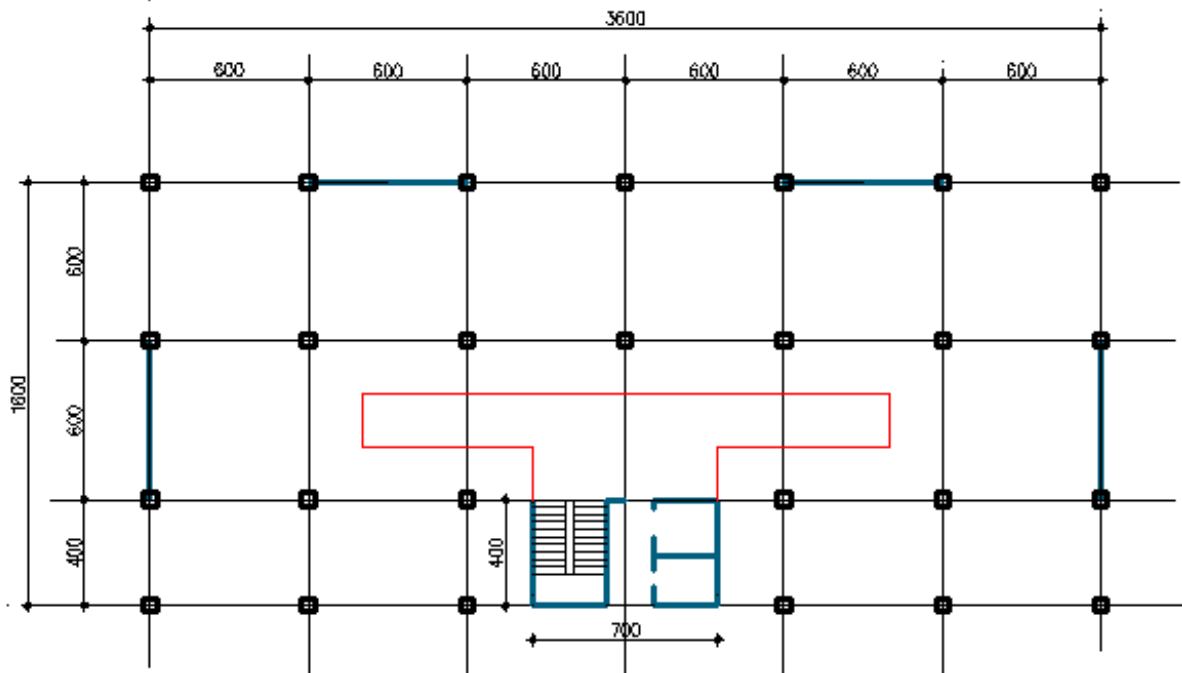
Rectangular structure with dimension 16x36 m and with columns axis, every 6 m with concrete core wall to one side with dimensions 4x7 m and with four peripheral perforated panels with dimension 6 m (source: the author)
